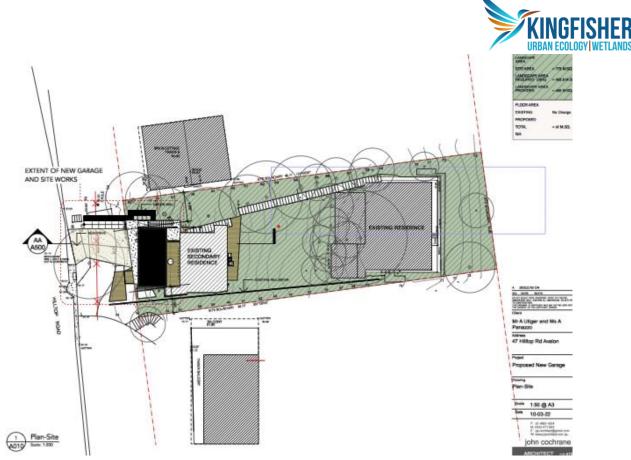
Site Plan. Source: John Cochrane Architect 28/03/22 Rev A.
